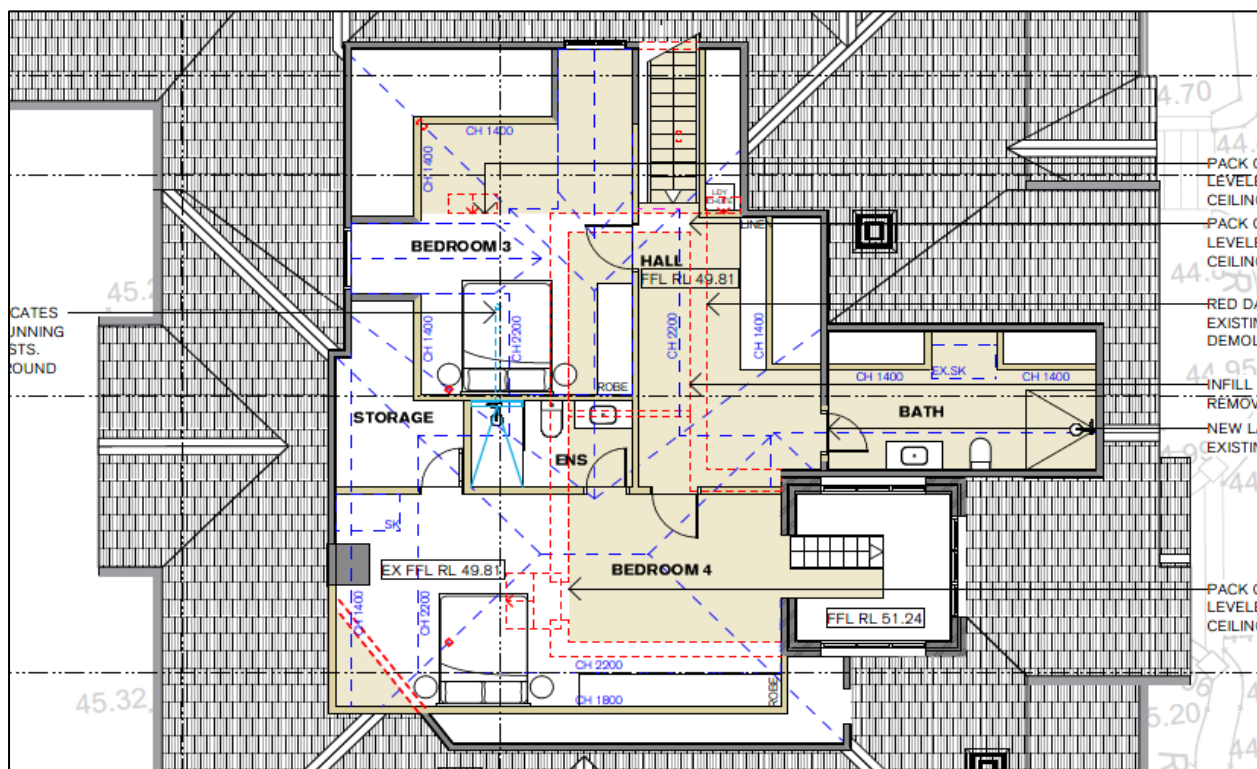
Extract of the applicant's submitted revised Attic Floor Plan.
